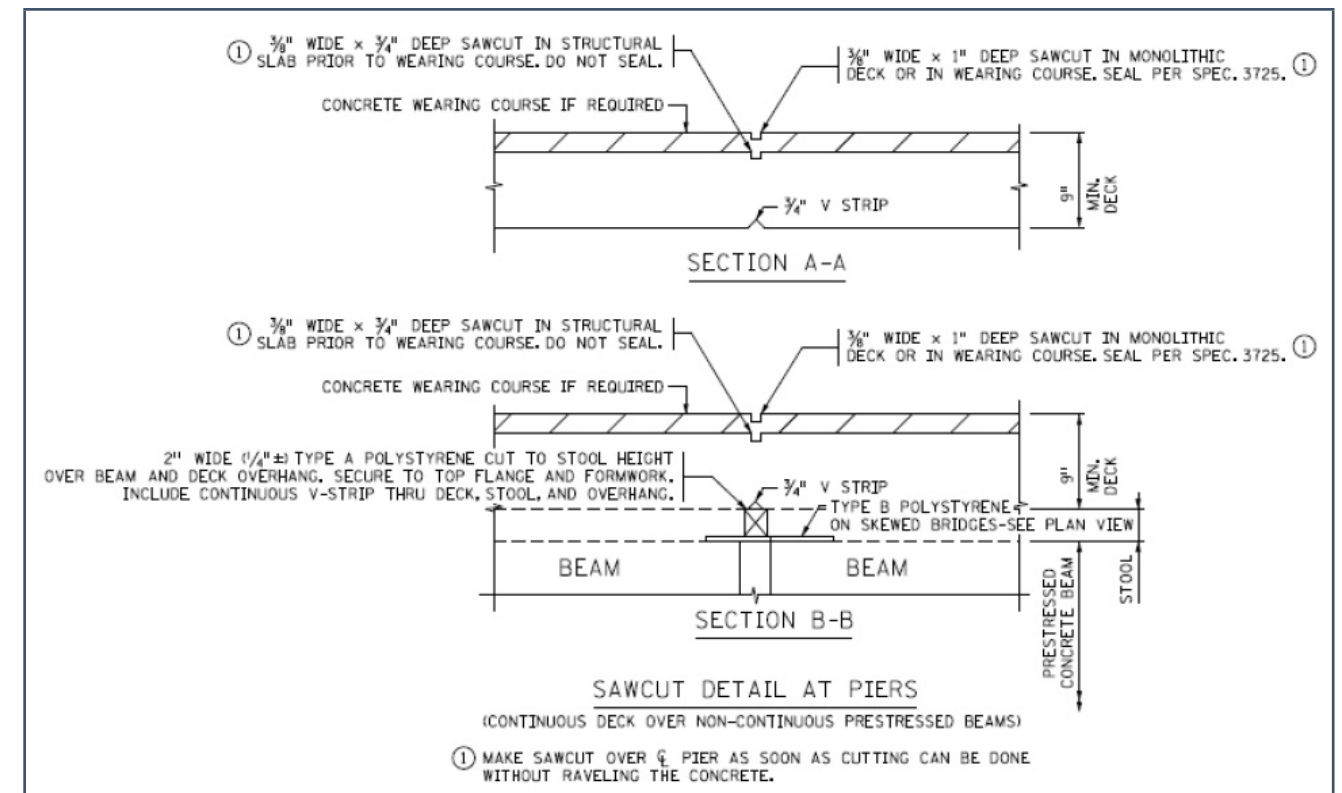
Sawcut of the deck between beams (Section A-A) and at beams (Section B-B) to constrain cracking to the area from Minnesota DOT
